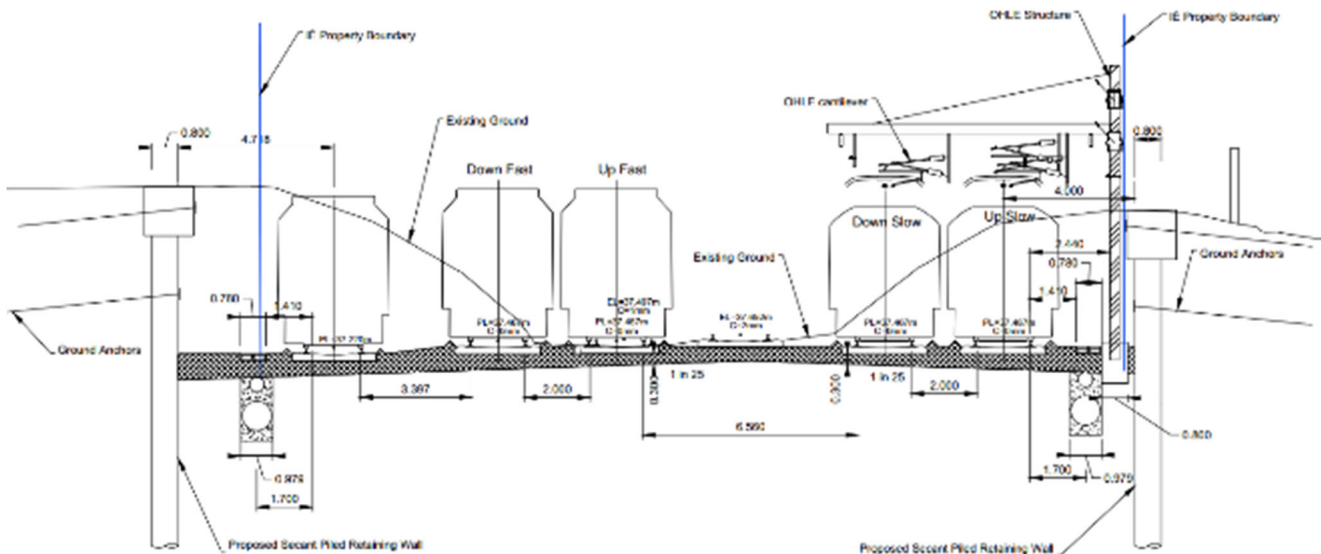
Network 1 Cross Section from Kylemore Road to Inchicore Depot
